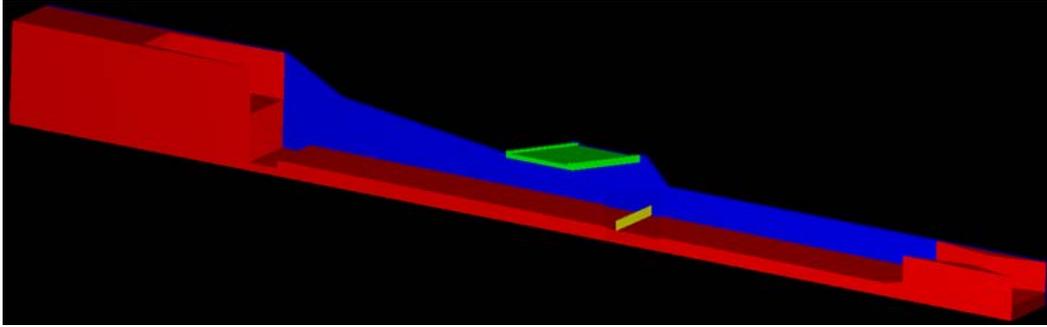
Stoplog baffle located beneath road bridge, as tested in 2013. The near wall of the approach channel is not shown.
